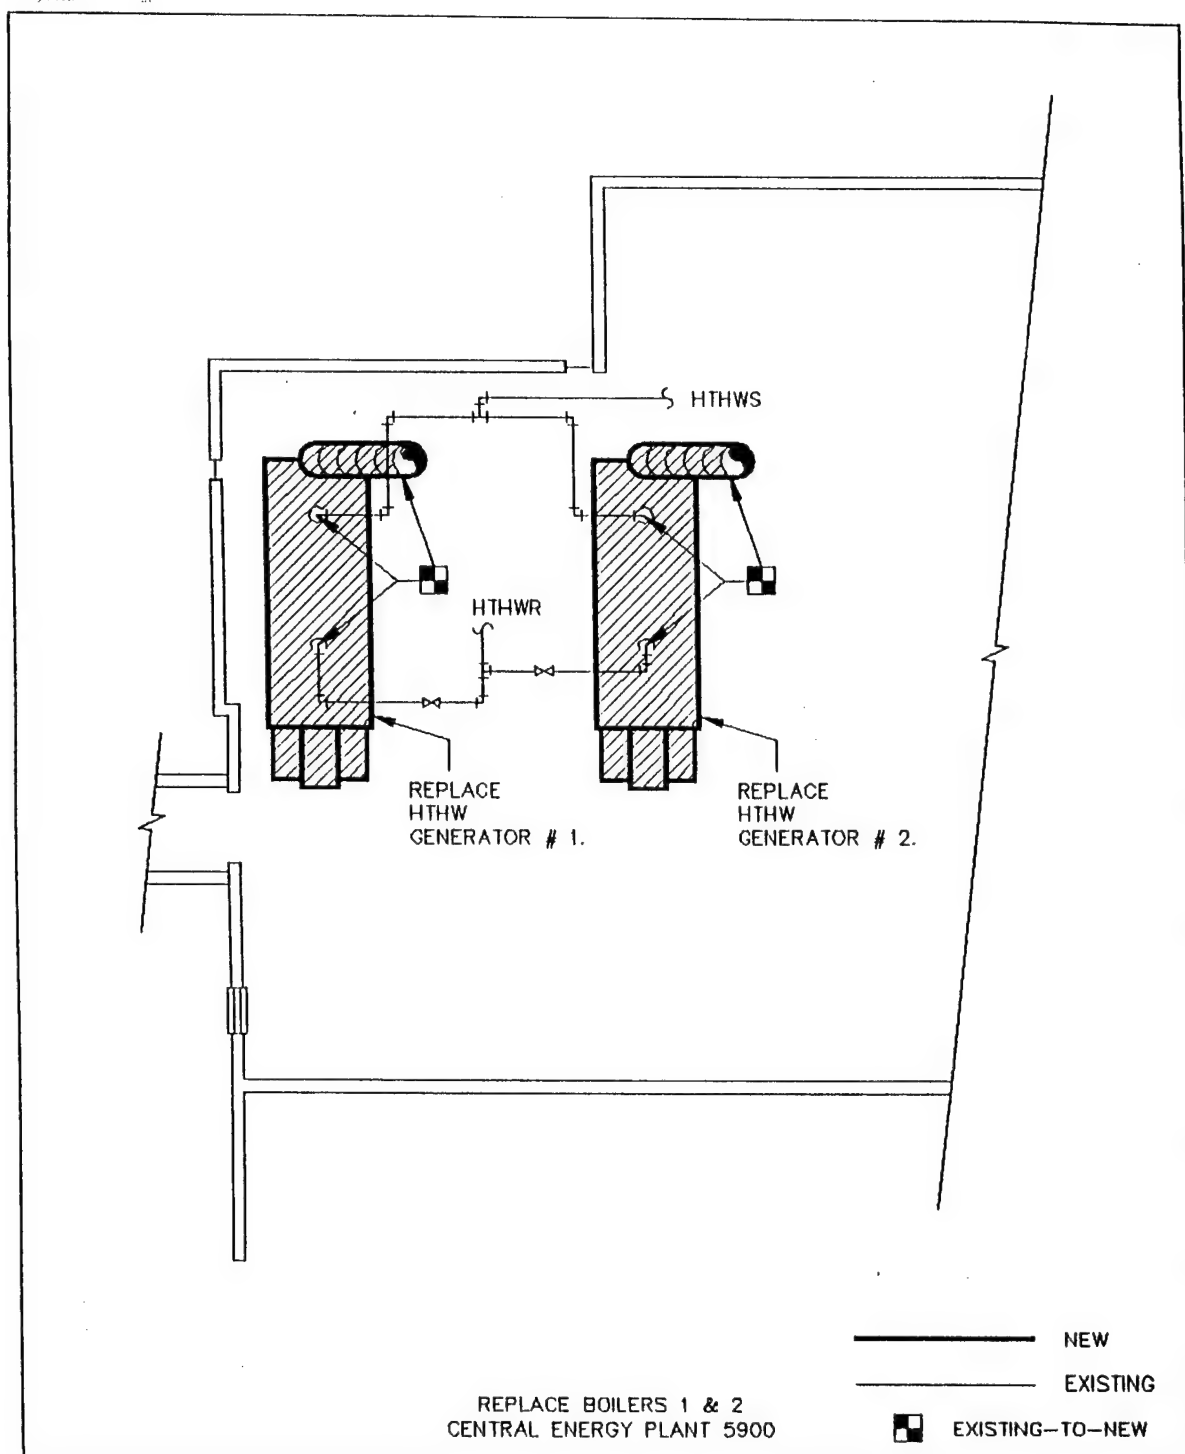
MECHANICAL ROOM LAYOUT, CENTRAL PLANT 5900
